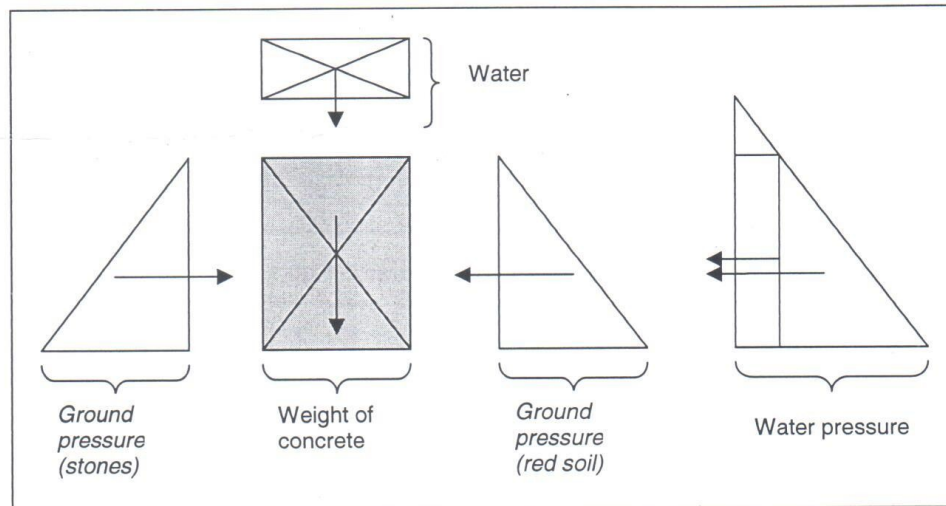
Horizontal and vertical forces on an impermeable dam.
